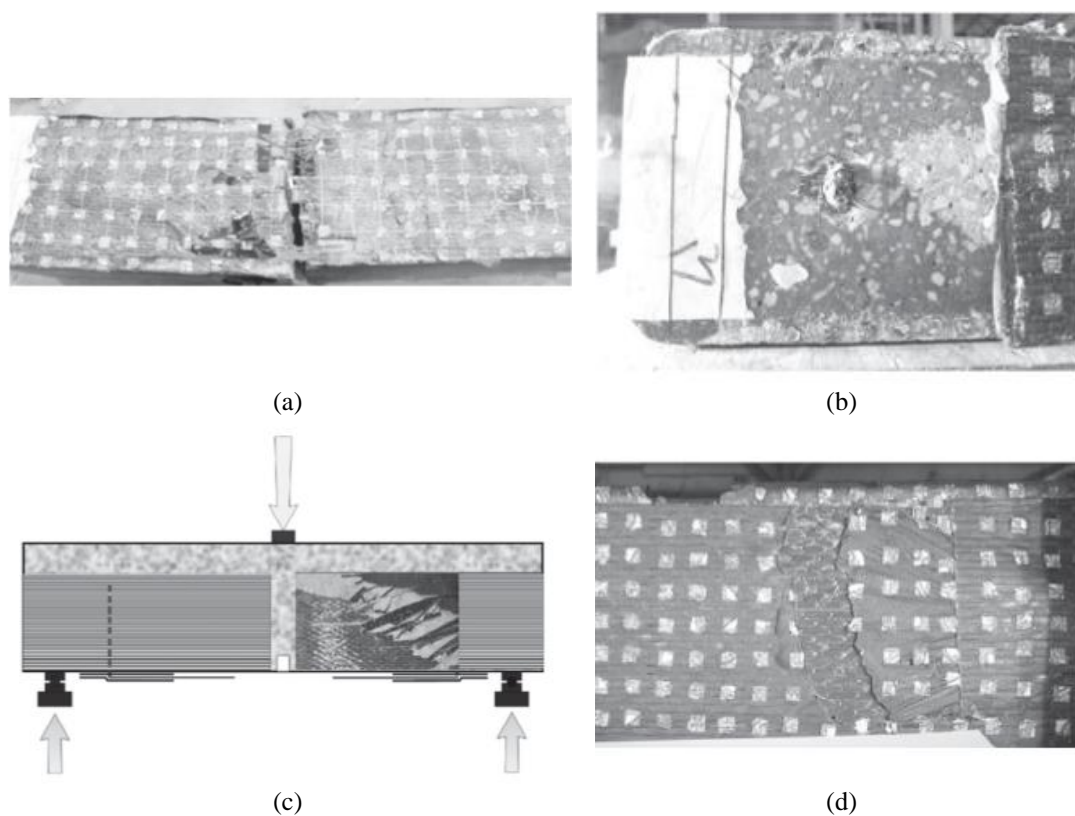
Failure modes: (a) CFRP strip fracture; (b) CFRP anchor rupture; (c) Concrete beam shear failure; (d) Delamination between the CFRP strip and anchor fan [66].
